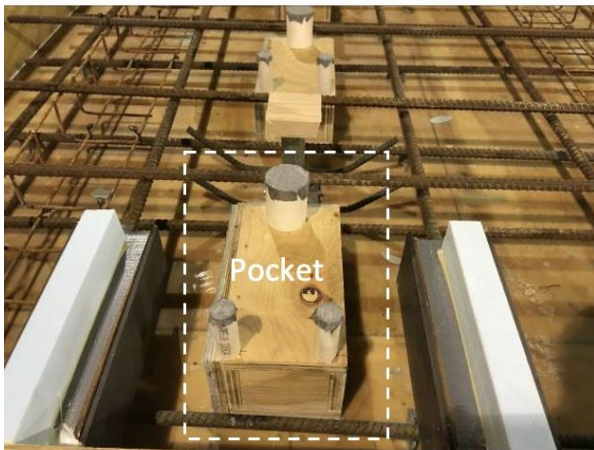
The PVC pipes were installed to form the grouting vents. Four leveling bolts were placed in each panel
